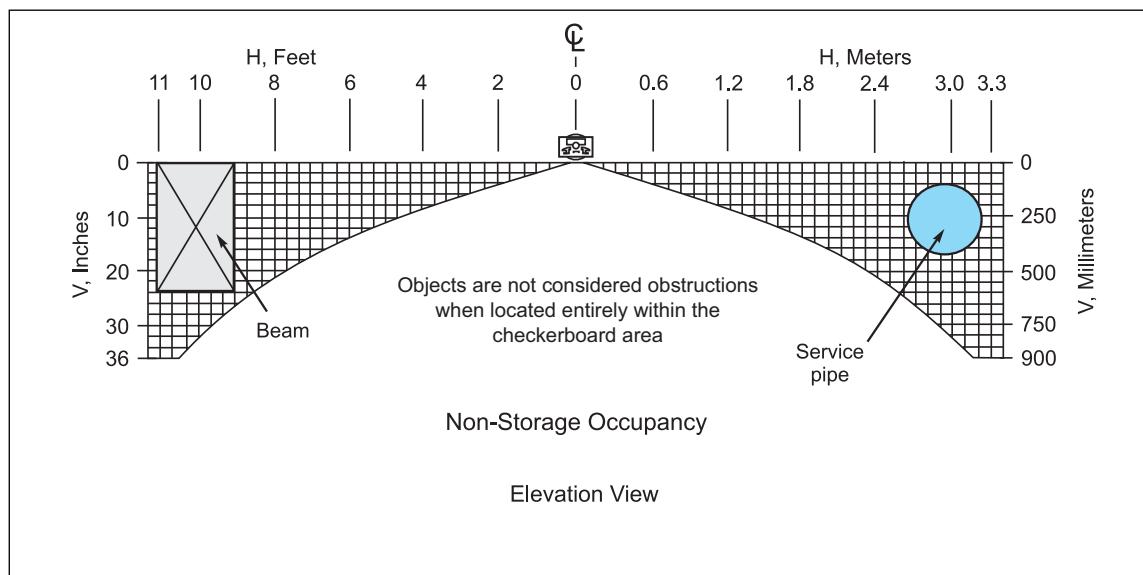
(a). Objects near ceiling level not considered obstructions to standard-coverage Nonstorage sidewall sprinklers along the mounting wall
